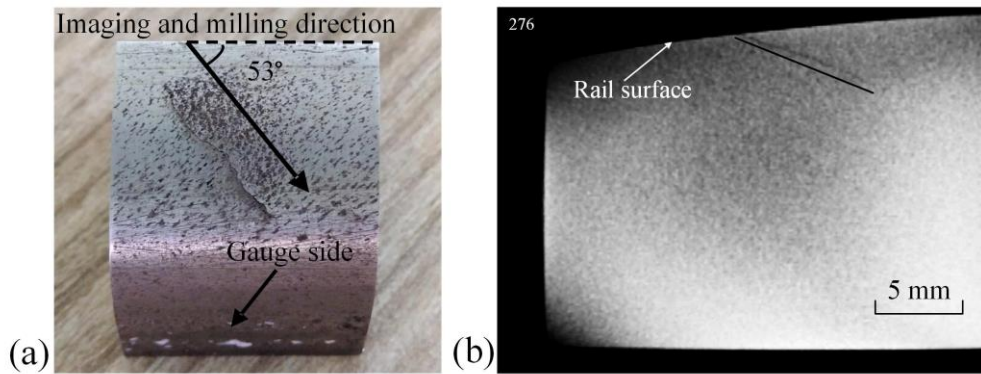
(a) Single crack 16 removed from the railhead sample and the imaging and the milling direction; (b) X-ray tomography image for crack 16 showing the position of the maximum pocket length of 6.0 mm (errors < 0.12 mm) and the vertical angle of 25.7° (errors < 0.1°).
